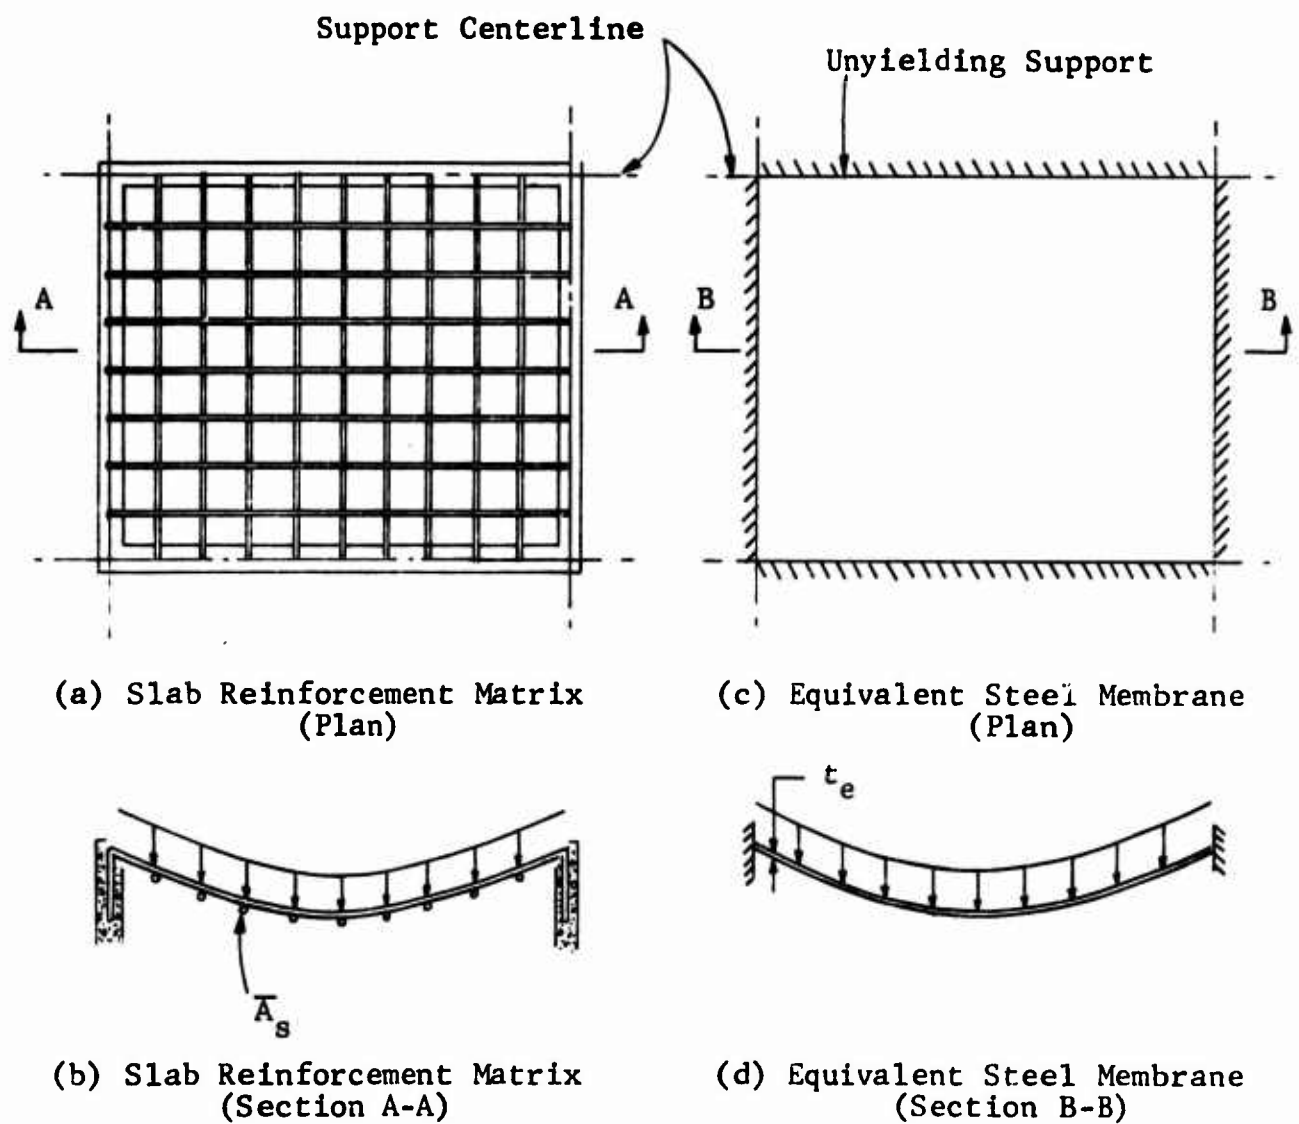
SLAB REINFORCEMENT MATRIX
